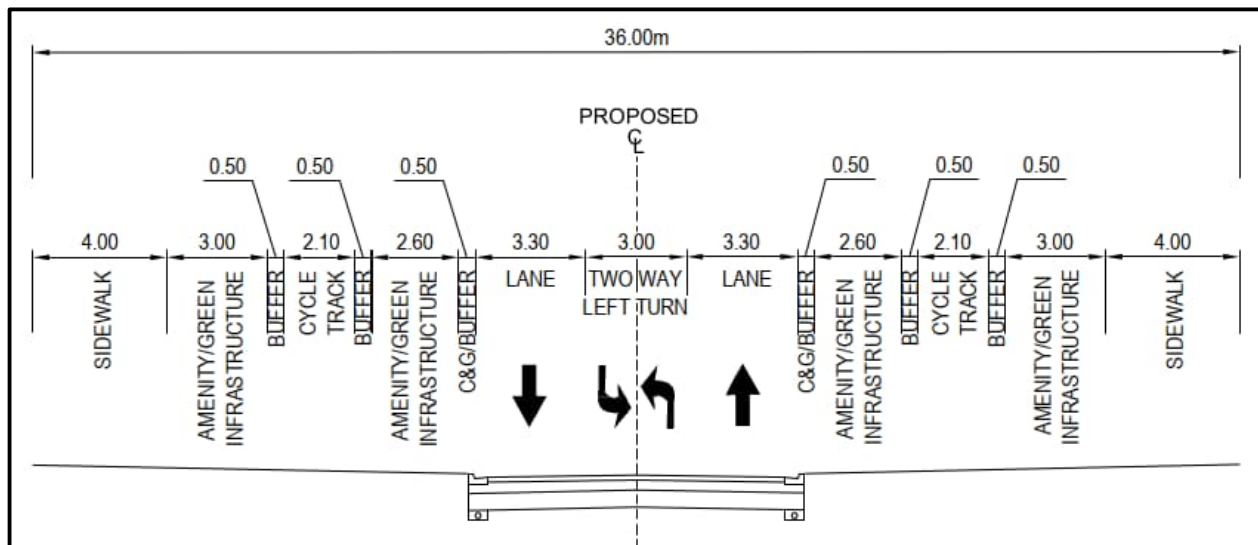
Park Lawn Road Improvements at Gardiner Expressway Bridge – Typical Concept Cross-section
